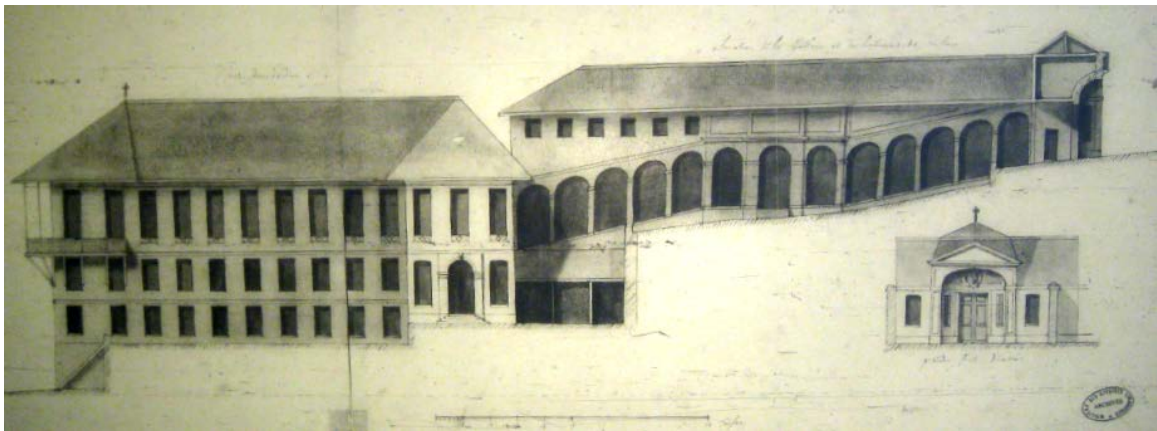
Pierre Vigné de Vigny, elevation of the proposed rebuilding of the Palais de France, including a cross-section and view of its principal gate, 1722. CADN, 166PO/A/252, fol. 35.
